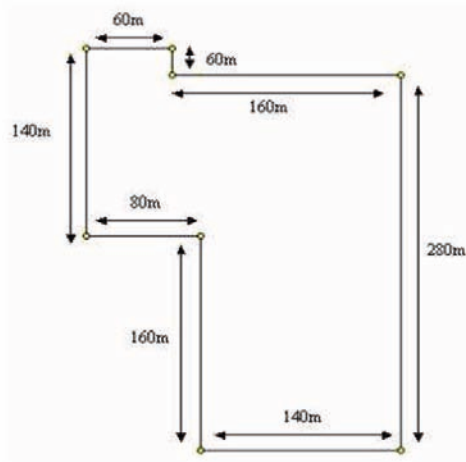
Orthogonal Example: Floor Plan and Dimensions
